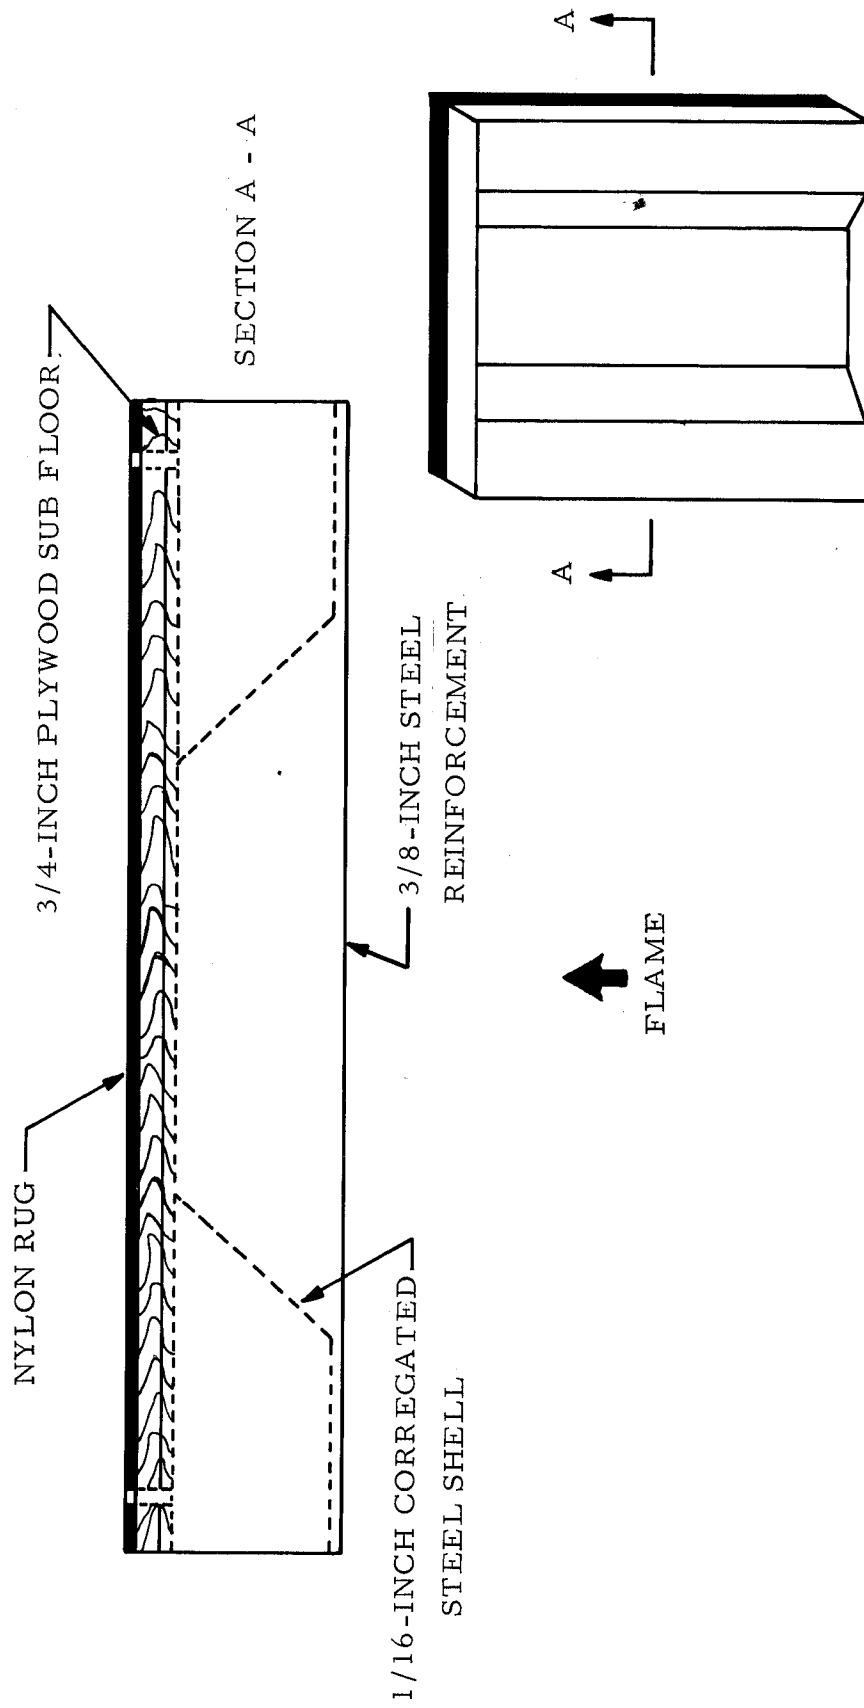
PANEL NO. 2A - SECTION VIEW OF FLOOR
